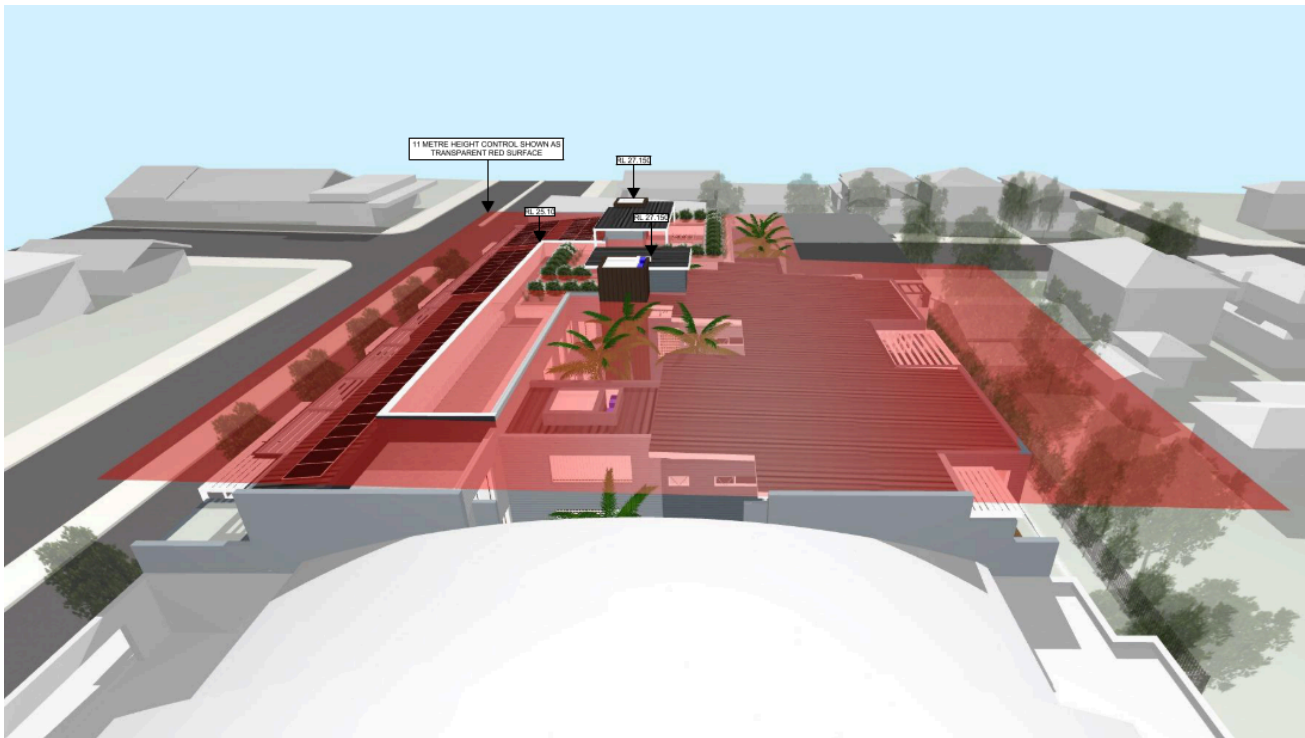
Applicant's illustration of the proposed building height breach as measured from existing ground levels.
